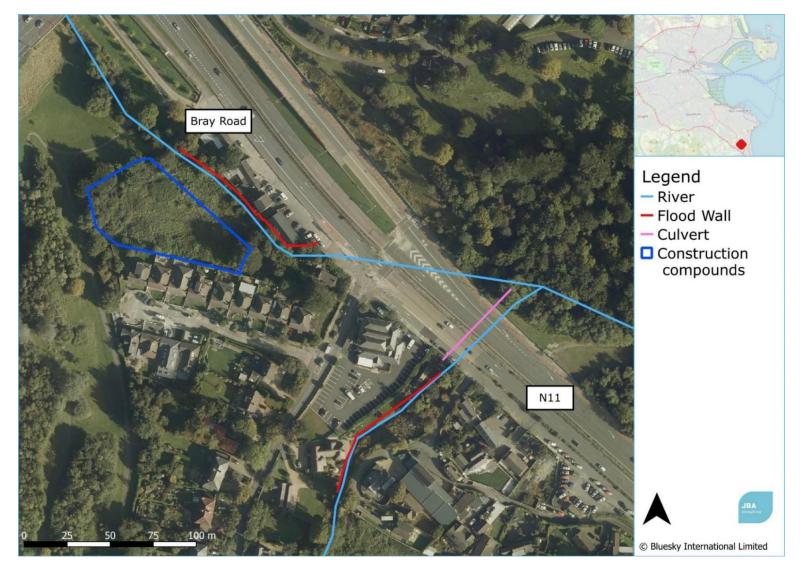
Proposed Works at Lower Brides Glen and Bray Road - 4.B, 4.C and 5.D
